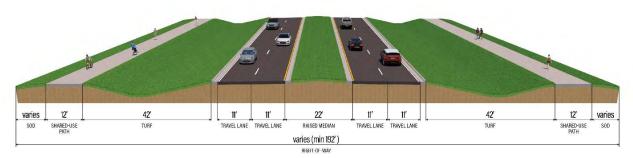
Suburban Typical Section (Segments 1, 4, and 6)
